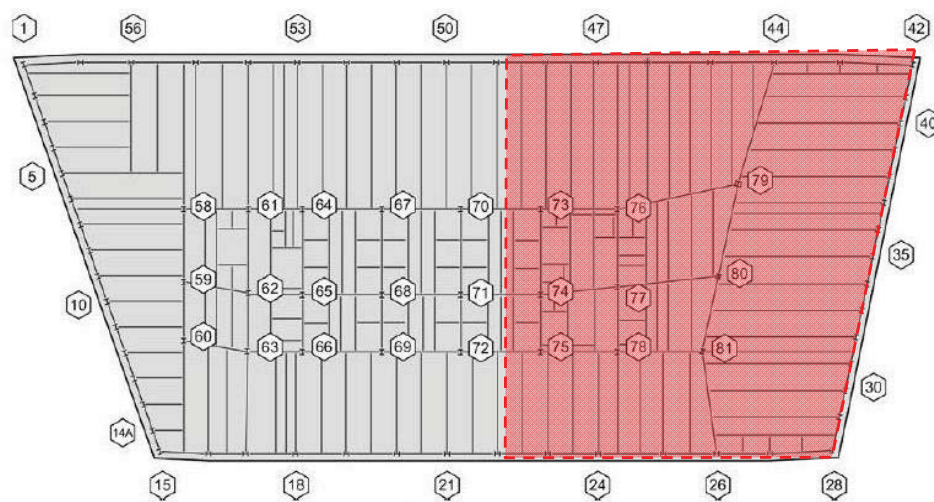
Extent of floor area of structural fire model on the 13th floor.
